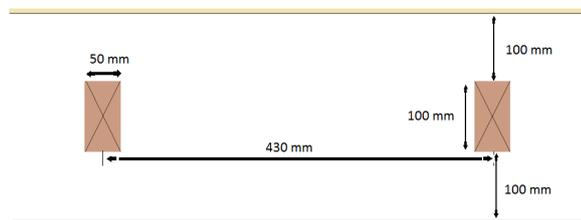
Indication of the position of the wooden frame within a hempcrete wall
